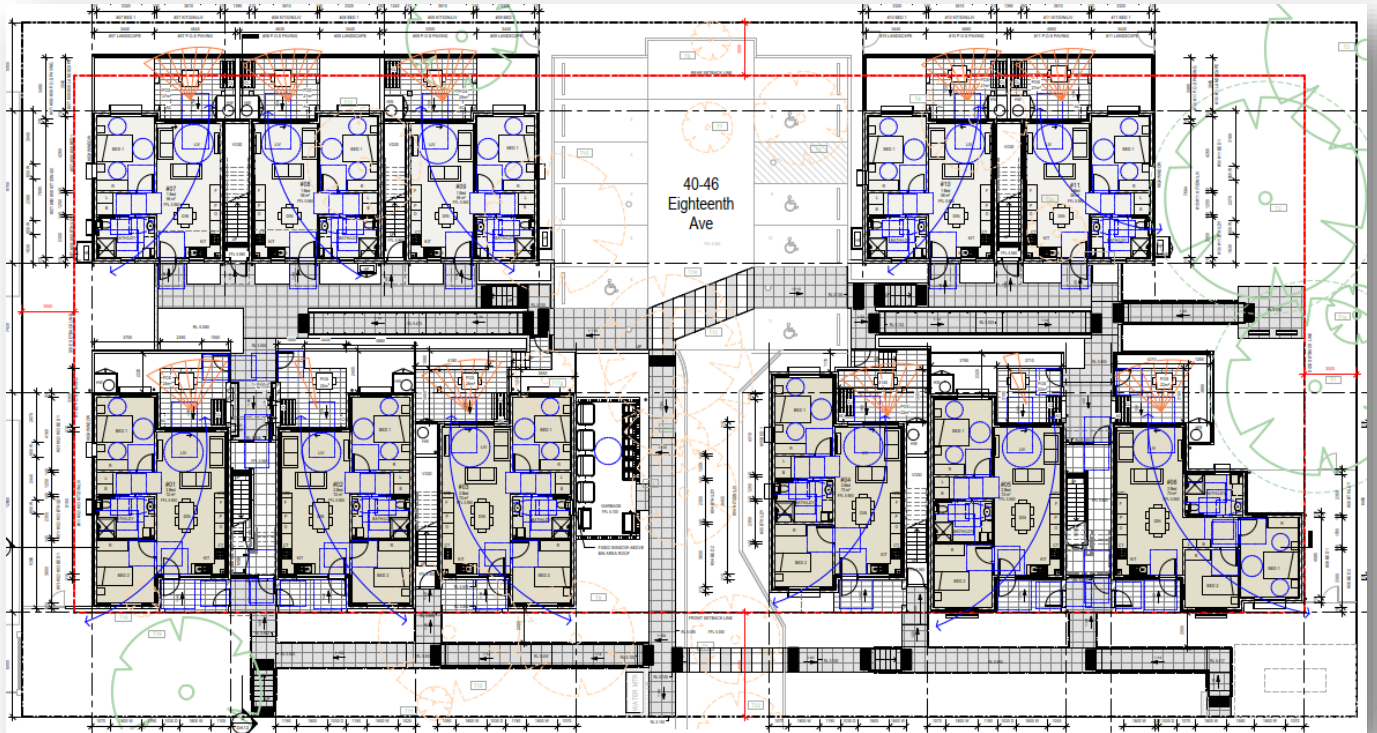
Extract from Architectural Plans – Ground Level (Source: Architectural Plans, Brewster Murray, dated 23/07/2024)
